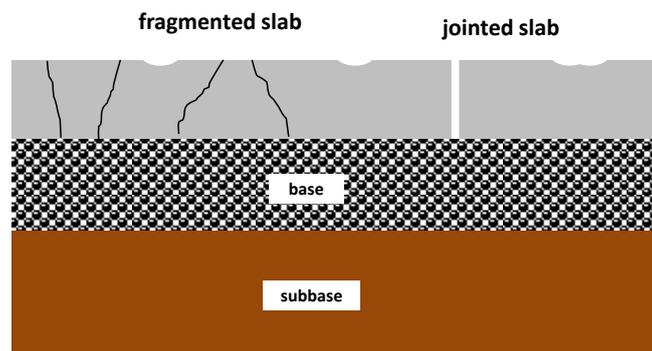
Typical cracks and surface damage of concrete pavement layer
